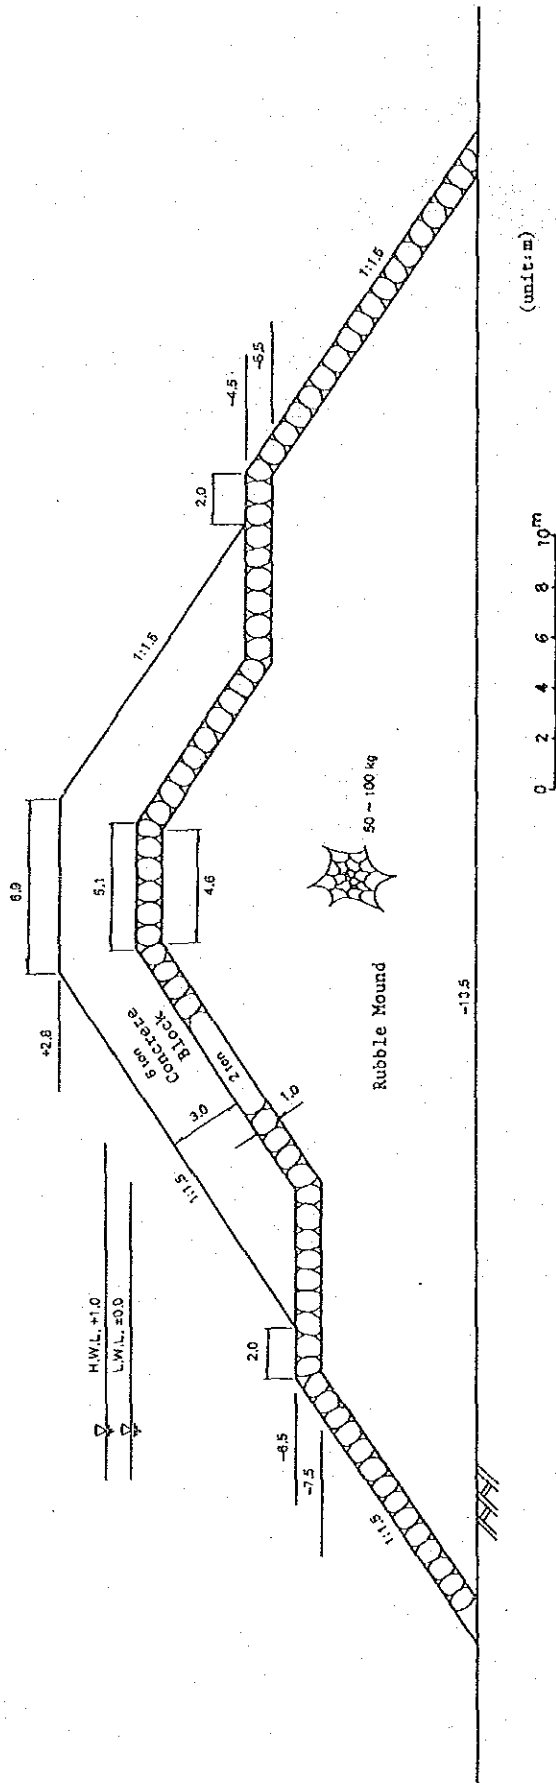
Cross Section of Breakwater (Alternative A)
